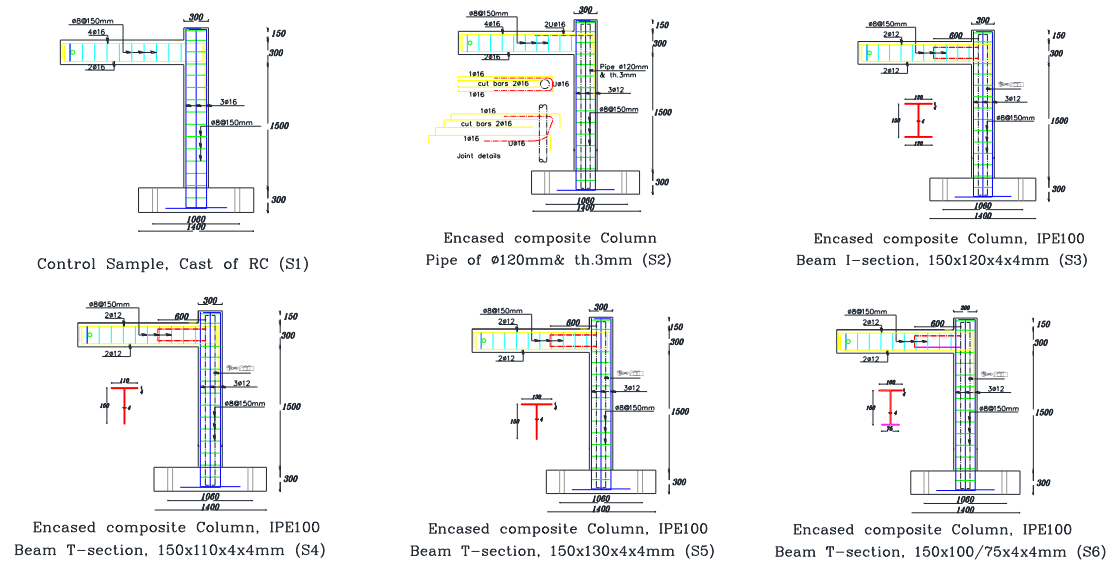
The dimensions, reinforcement, and steel sections of columns, beams, and joint
